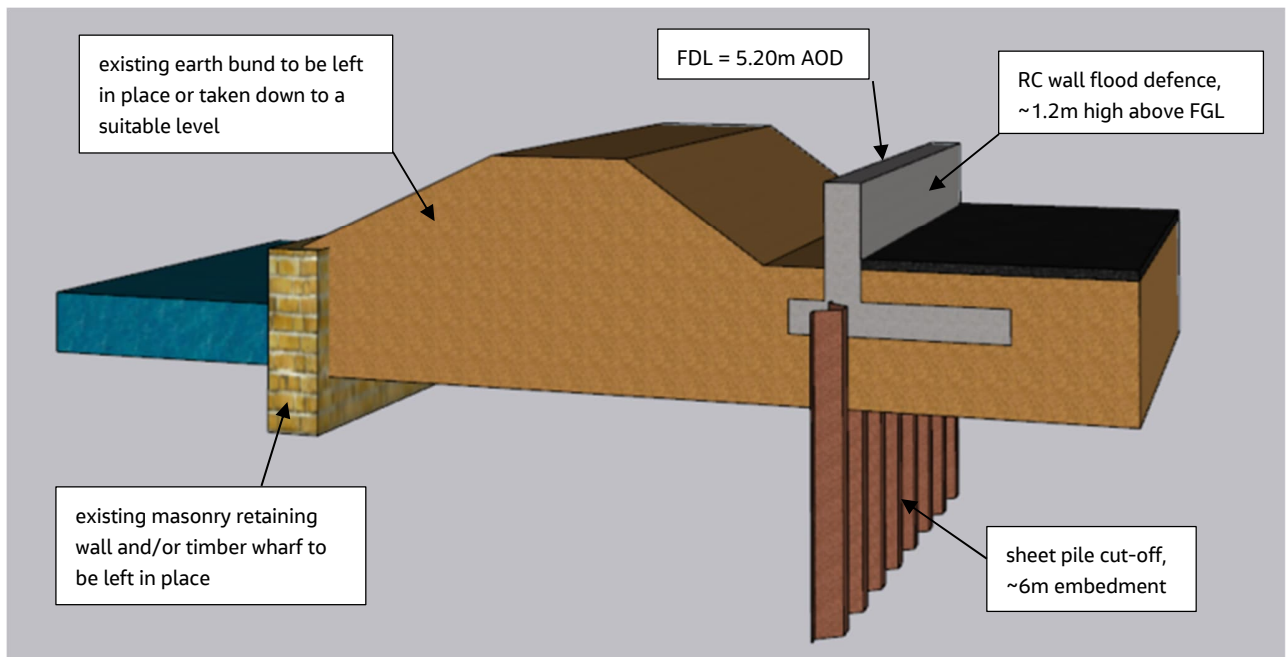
Option C2, RC cantilever flood wall with seepage cut-off
